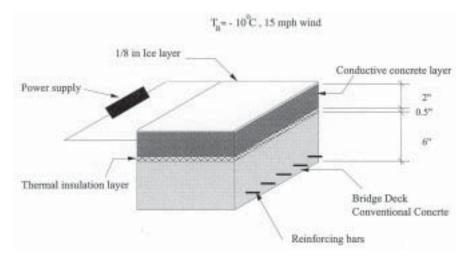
Concept of using conductive concrete overlay for bridge desk deicing.
